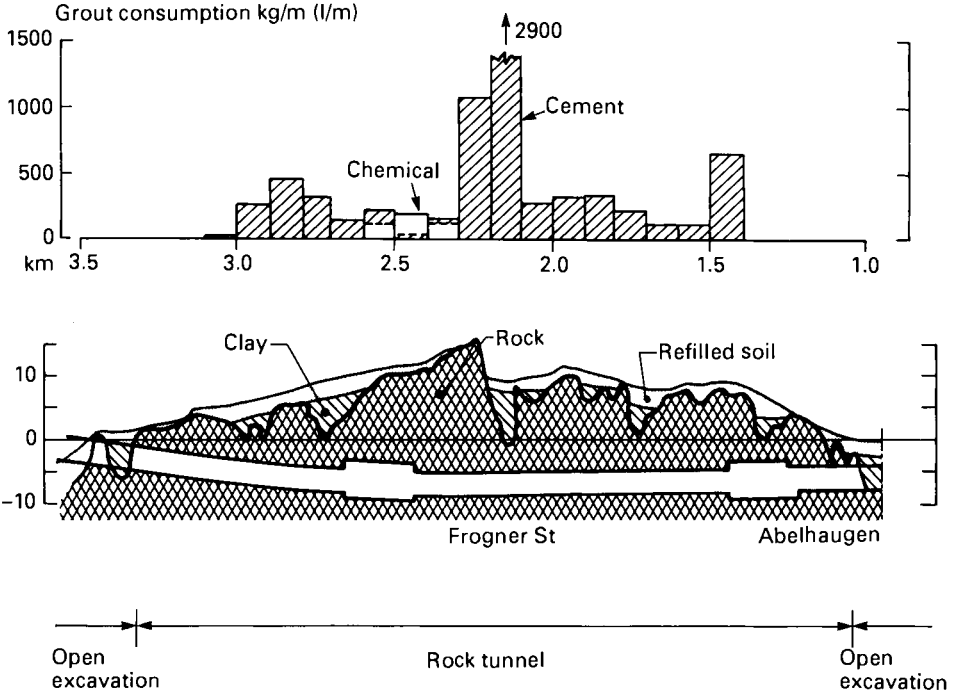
Longitudinal section and grout consumption for the Oslo railway tunnel (after Karlsrud[10])
